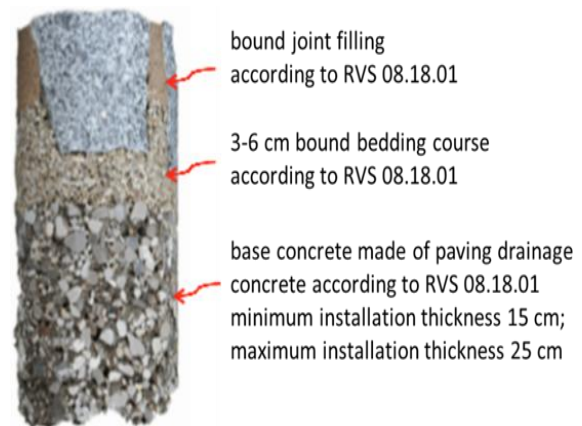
Cross-section of a rigidly constructed cobblestone pavement with 8/10 cm granite blocks according to RVS 08.18.01
